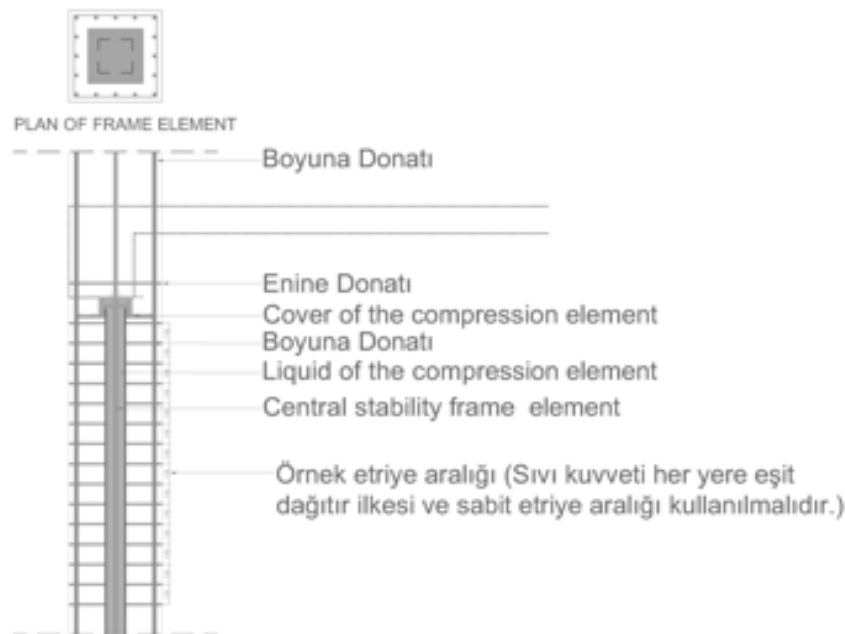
Integration scheme of the internal strength design for the columns and beams in reinforcement concrete systems.
